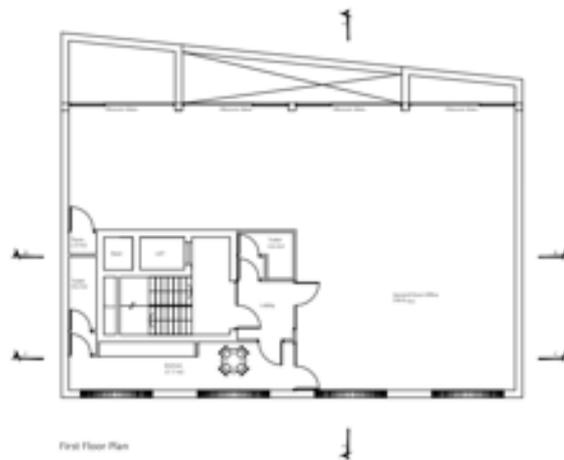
Proposed First Floor for refused scheme (Ref. P2020/1707/FUL)
